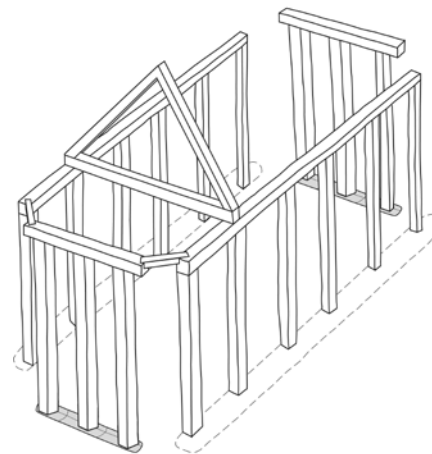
Suggested interpretation of the structure of a late Anglo-Saxon building. The end walls were joined to the side walls with dragon ties.
